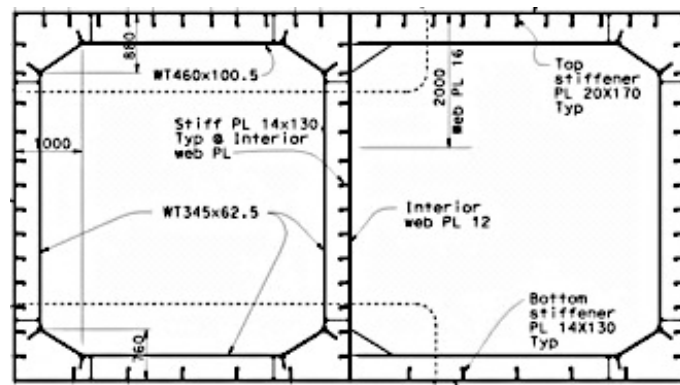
Typical crossbeam section (Ref.: Caltrans drawings 656/1204).
